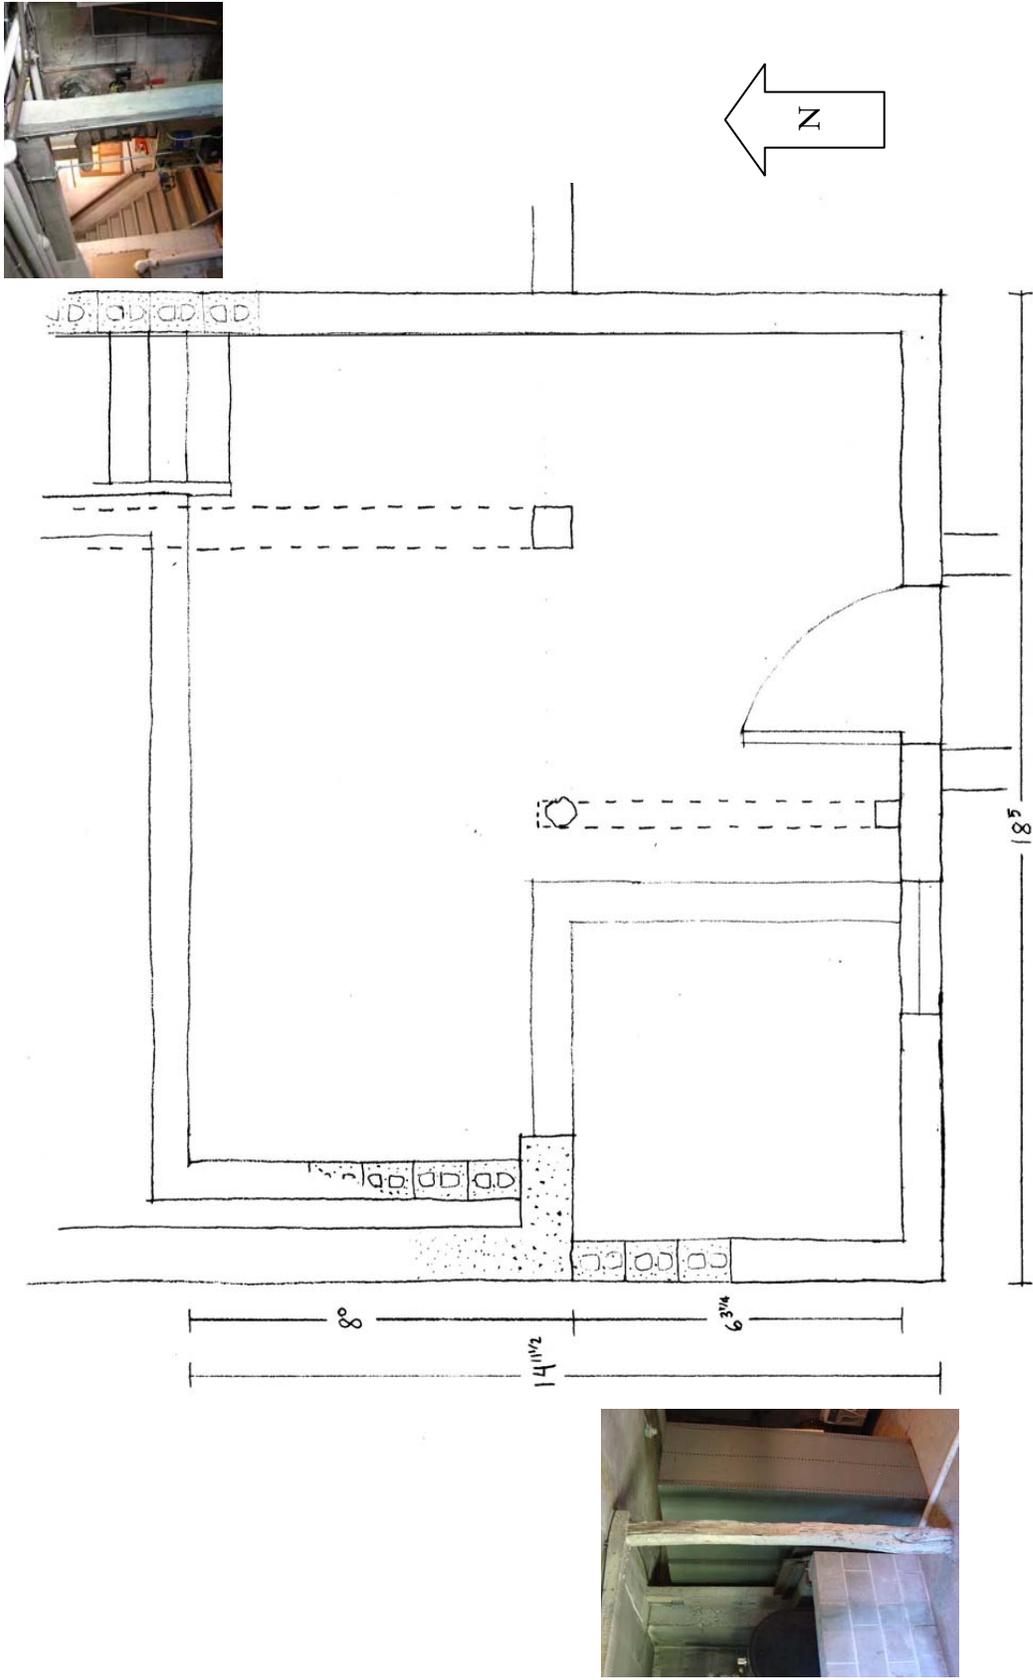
New Barn, schematic plan and photographs of basement utility room (2005). At left is a view looking northwest; at upper right is a view looking northeast.
